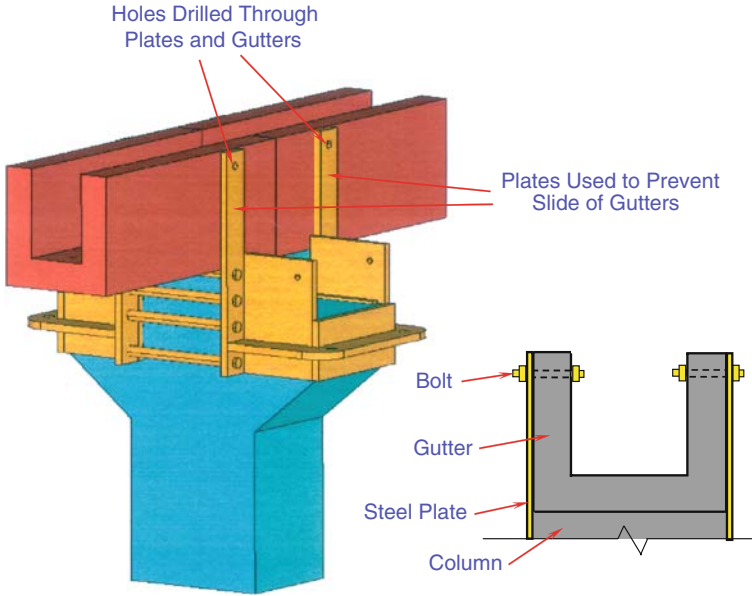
Plates used to prevent sliding of gutter beams at interior column
